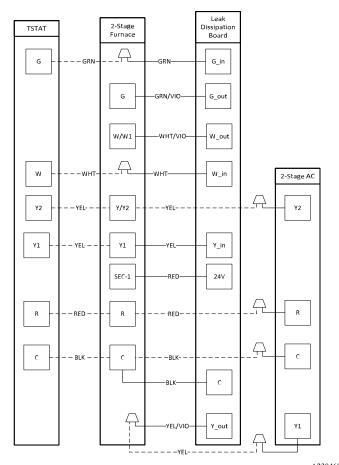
Wiring Layout, 2-Stage Air Conditioning Unit $^{\rm A230460}$
